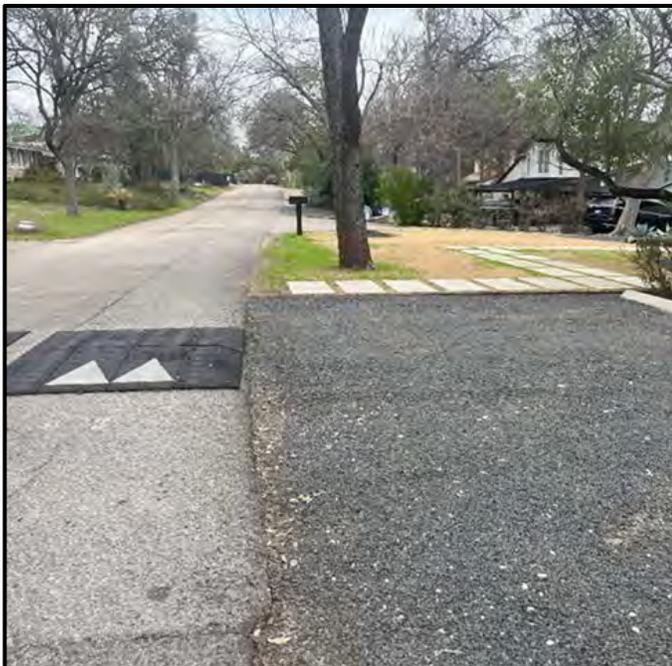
East right-of-way along North Peak Road. Parking for adjacent residence. Looking north.
